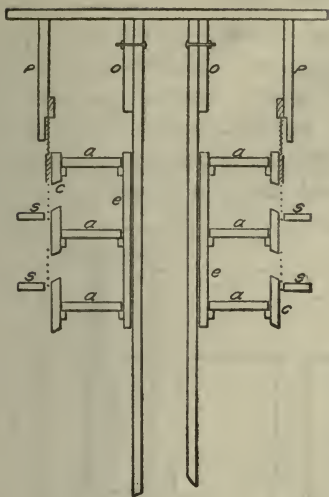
Longitudinal vertical section of martin house; lowered, and doors closed.
